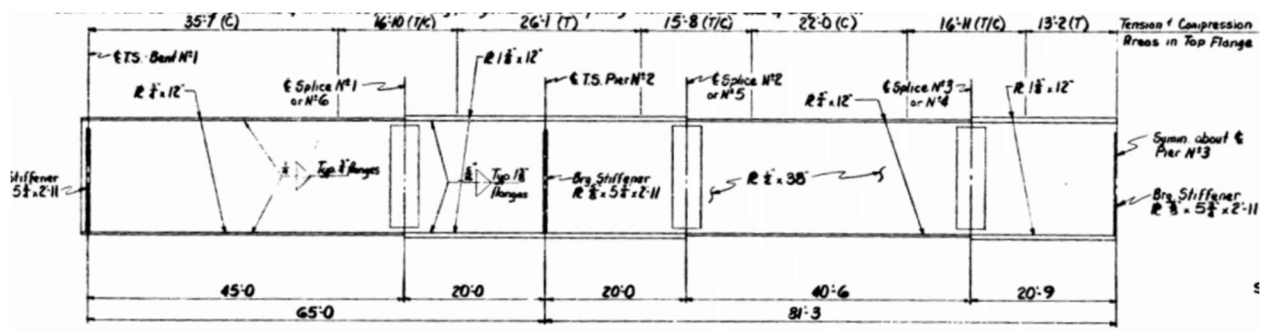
Typical Plate Girder Elevation for Bridge (NBI 19430) (1982)
